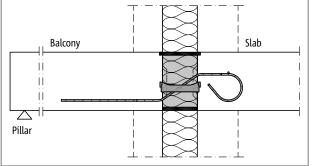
Schöck Isokorb® XT type Q: Connection with non-load-bearing double wall masonry (XT type Q-V1 to V4)
